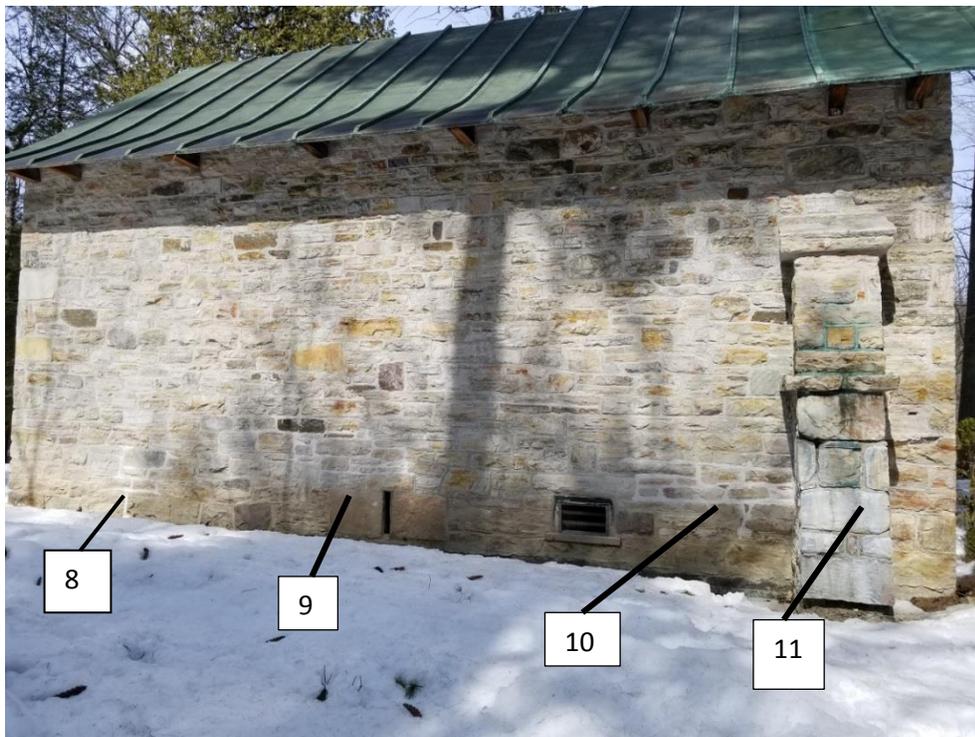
Photo of South elevation of Papineau Chapel indicating the test mortar locations
